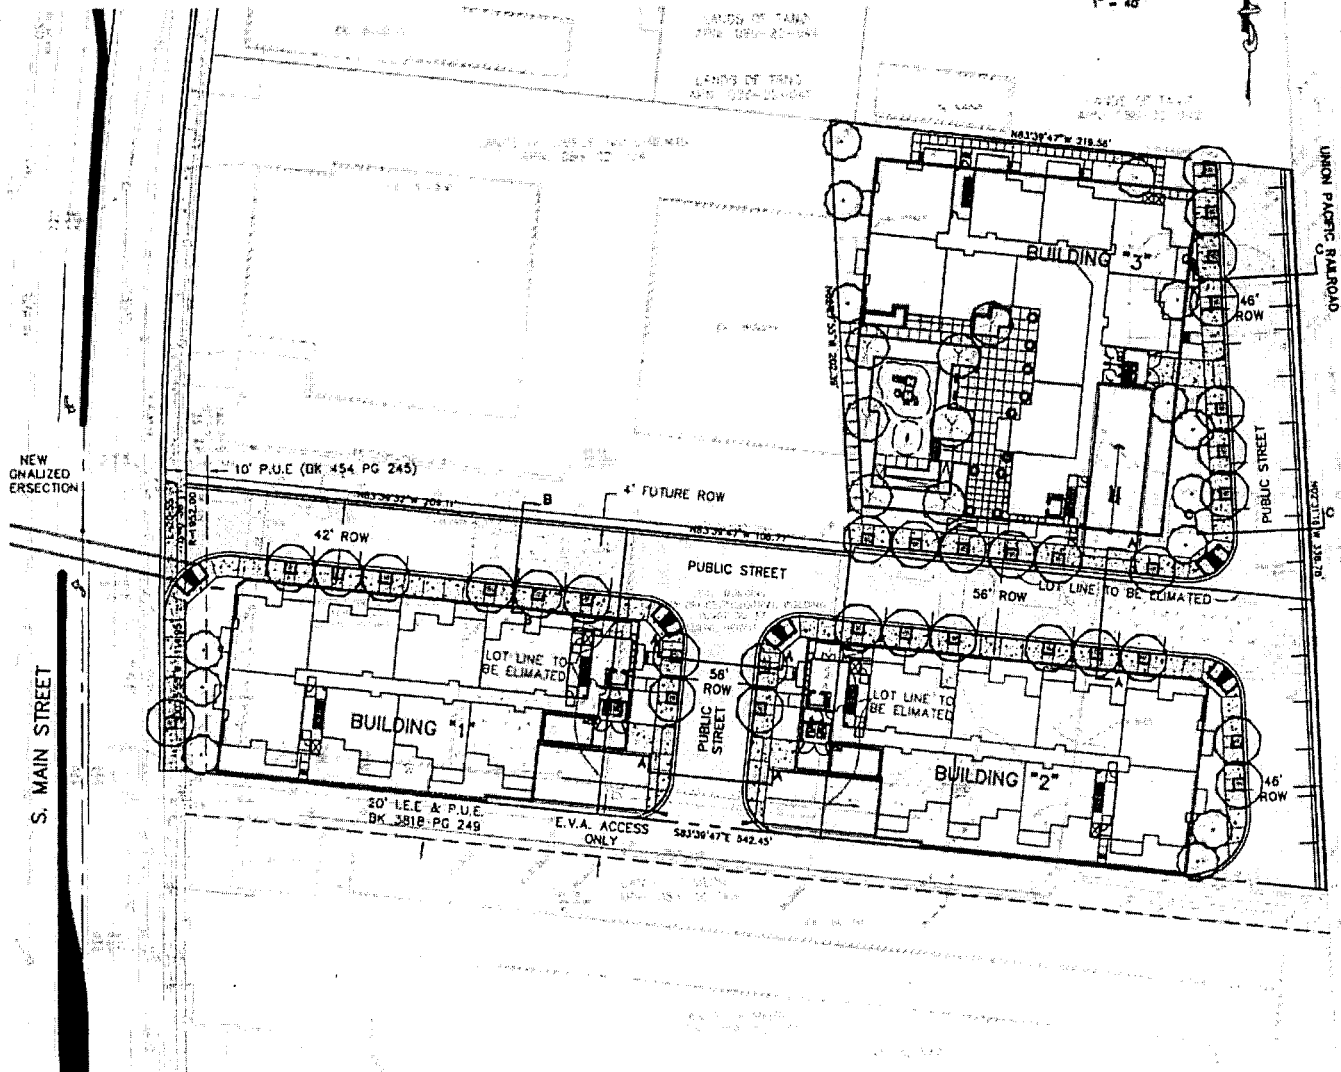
Reduced Site Plan of The Proposed Aspen Family Apartments.
